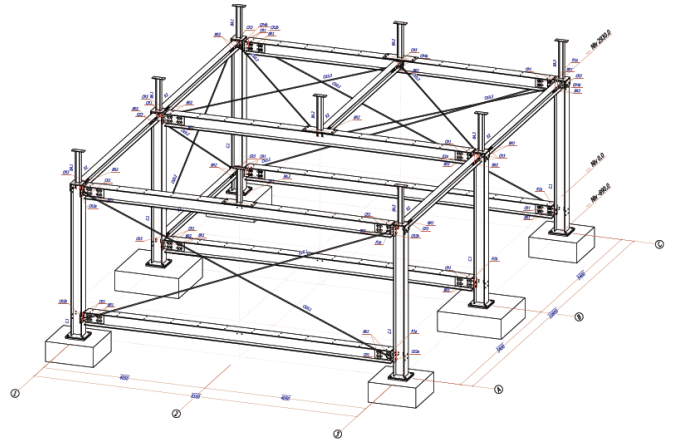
Drawing of the Petite Maison steel structure with concrete foundation blocks
